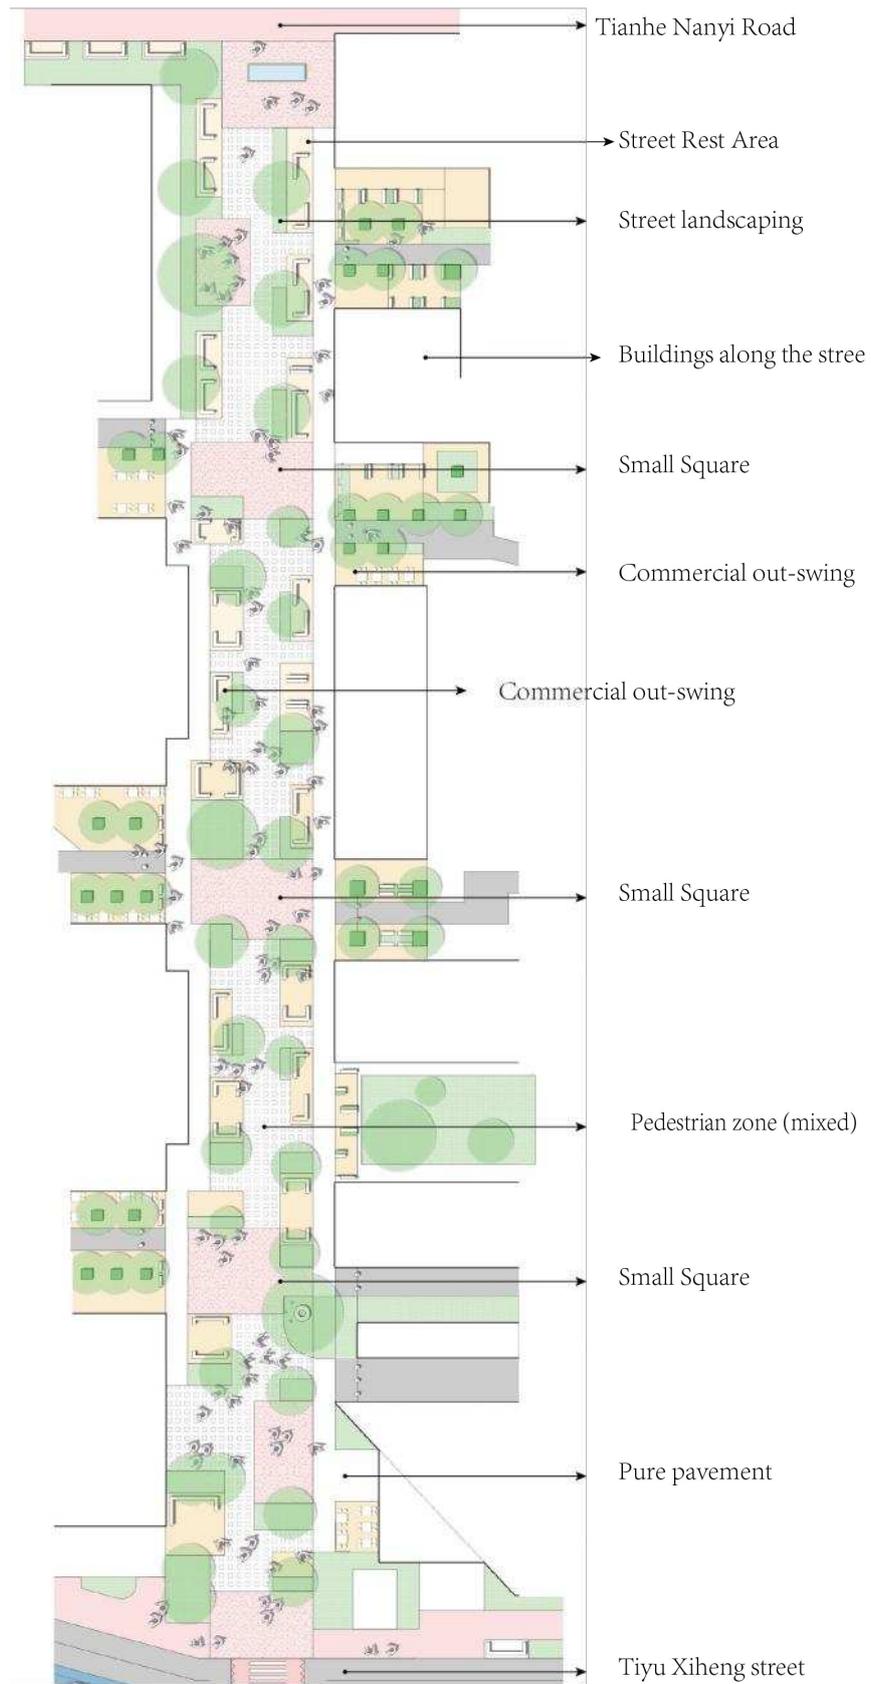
Renovated plan and section of Tianhe Nan Pedestrian street(northern section)(Source: Completed by author)
